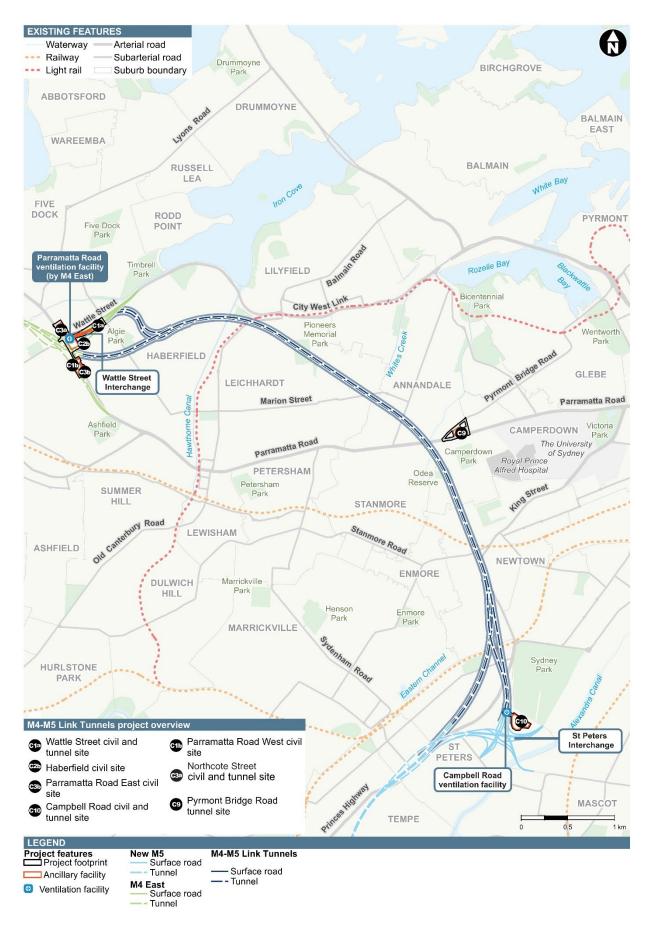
Overview of the M4-M5 Link Tunnels project (Stage 1)
